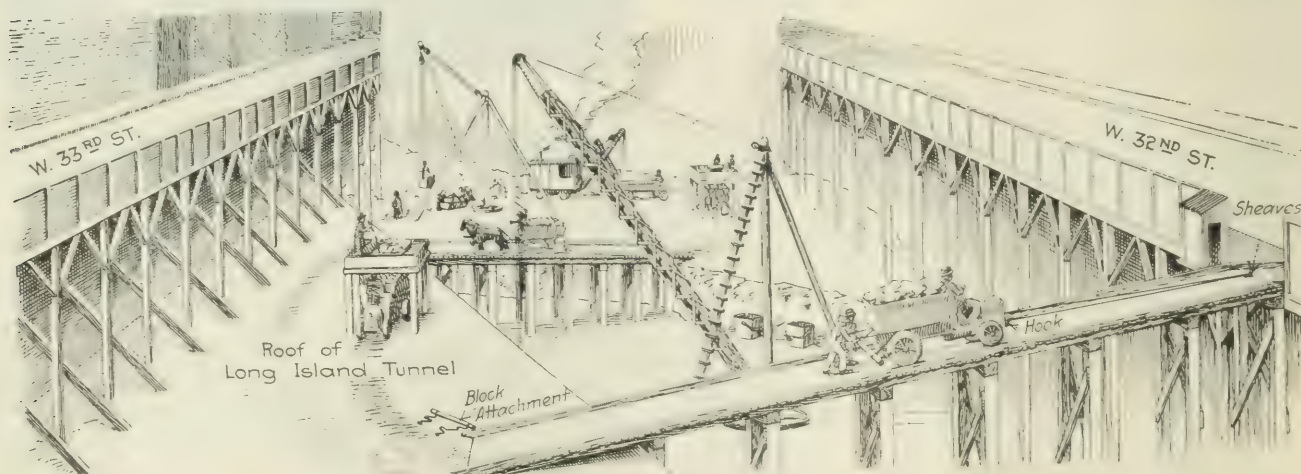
HANDLING ROCK AT SITE OF PENNSYLVANIA HOTEL, NEW YORK CITY
